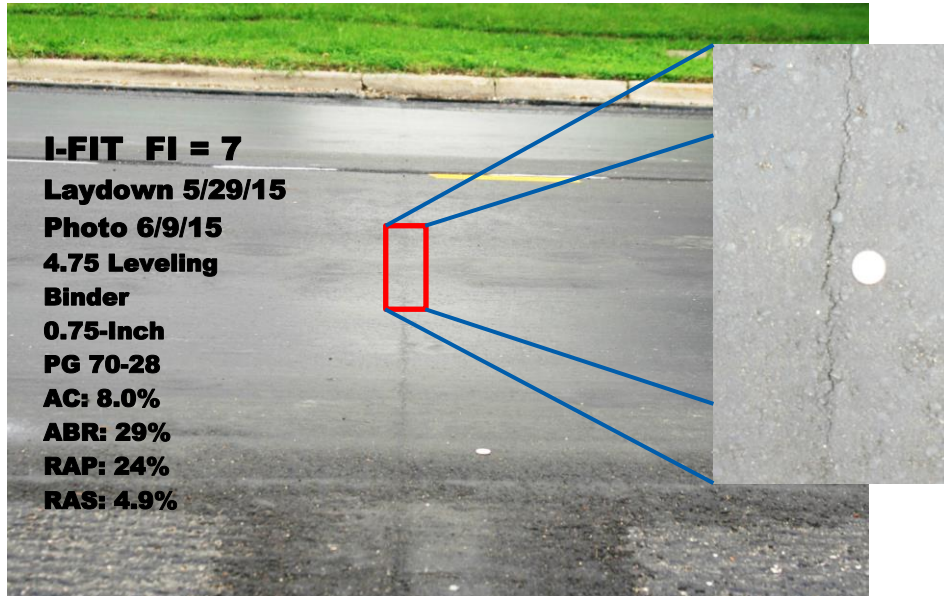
Reflective crack in leveling binder of Washington Street Segment 1
